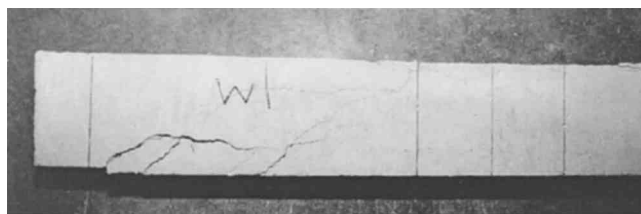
Failure of B-21-S-102 by debonding of layer along reinforcing bar.
